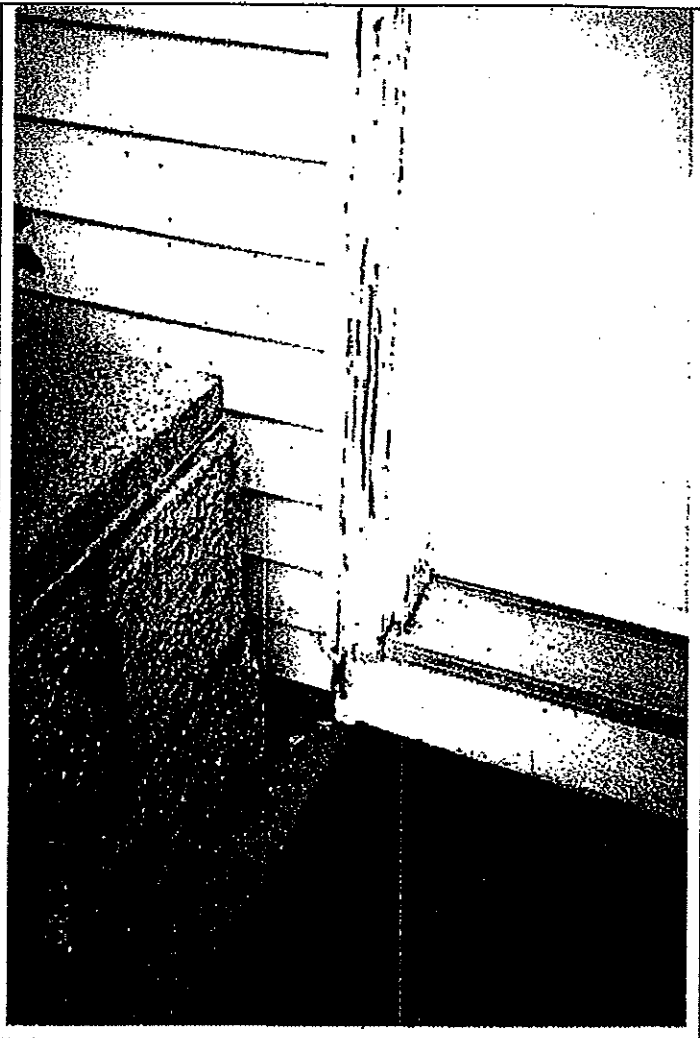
Typical peeling paint at the base of a door jamb.
